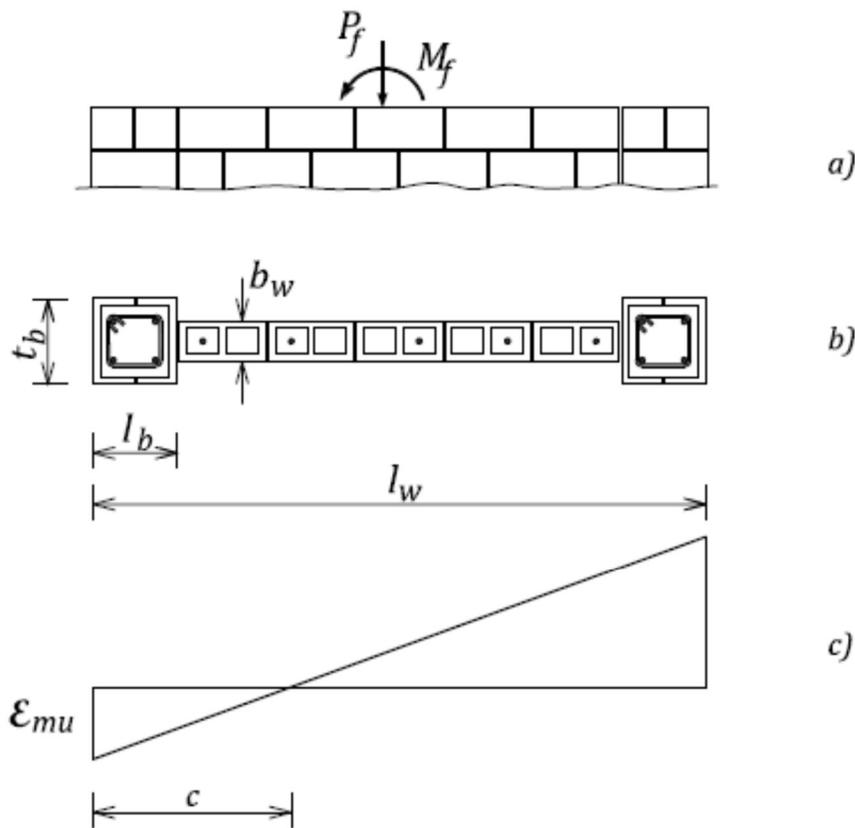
A RM shear wall with boundary elements: a) wall elevation; b) wall cross-section showing boundary elements, and c) strain distribution.
